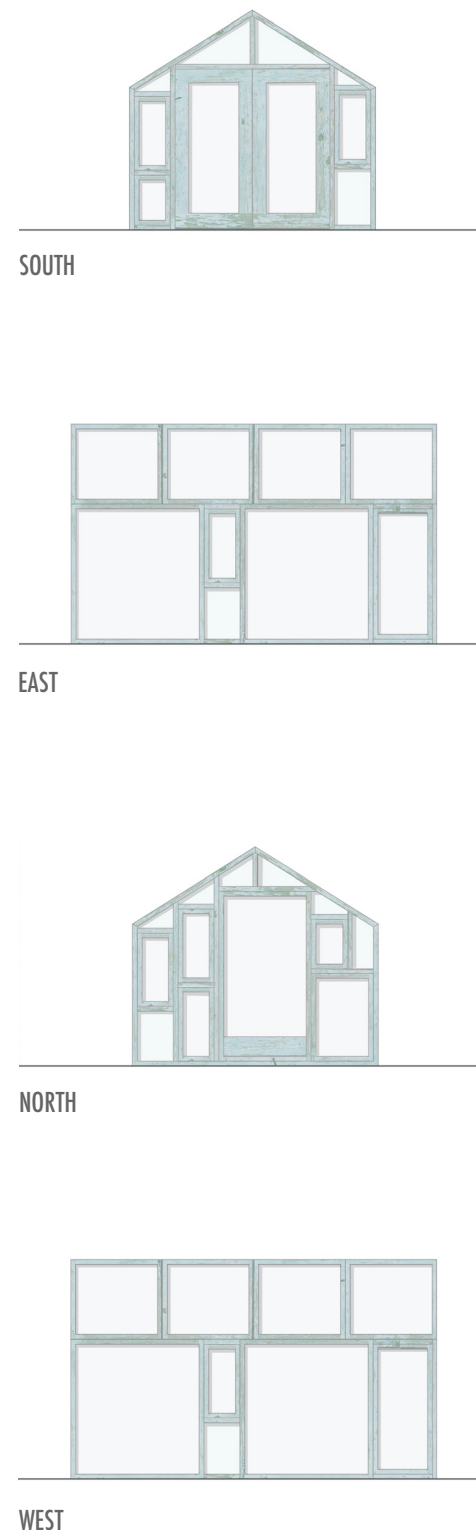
ELEVATIONS OF THE GREENHOUSE, SCALE 1:100
